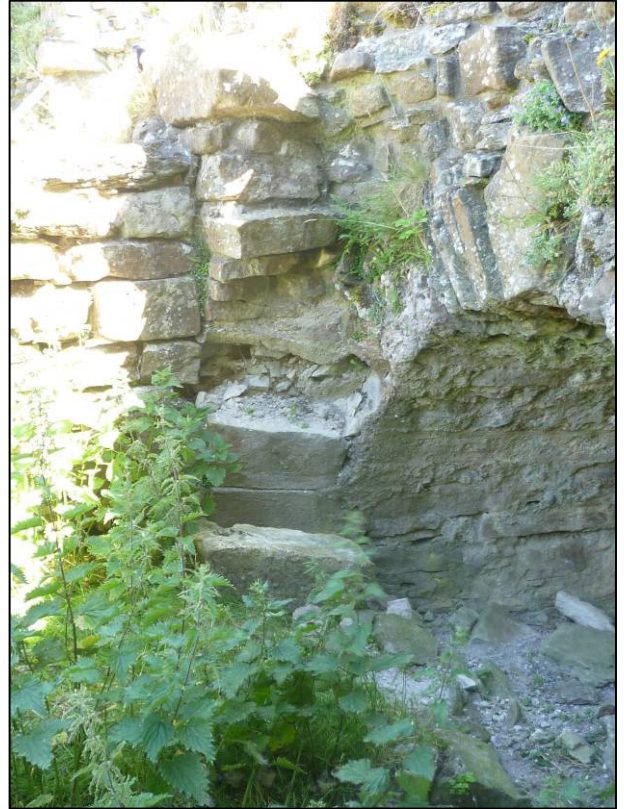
Pendragon Castle, interior, fallen voussoirs to west window of south wall, looking SW (photo 10/179).
